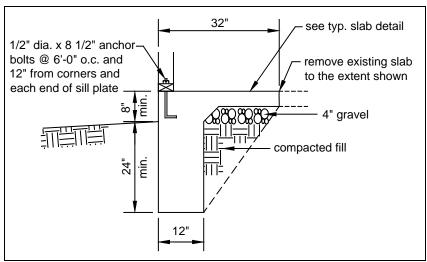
TYPICAL FOOTING/SLAB DETAIL
